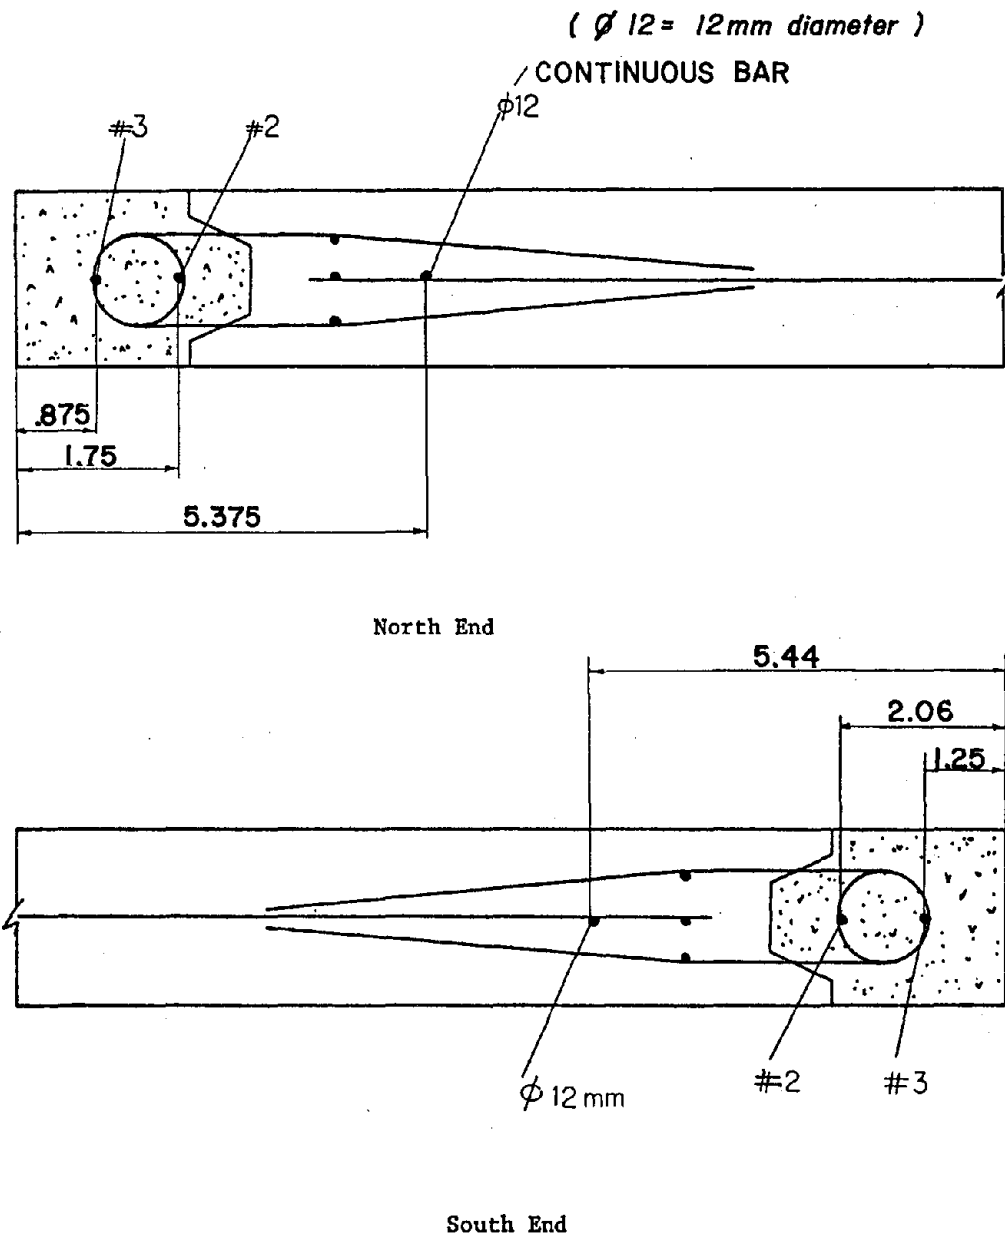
Joint detail for simple wall, PZ-I, (inch units).
